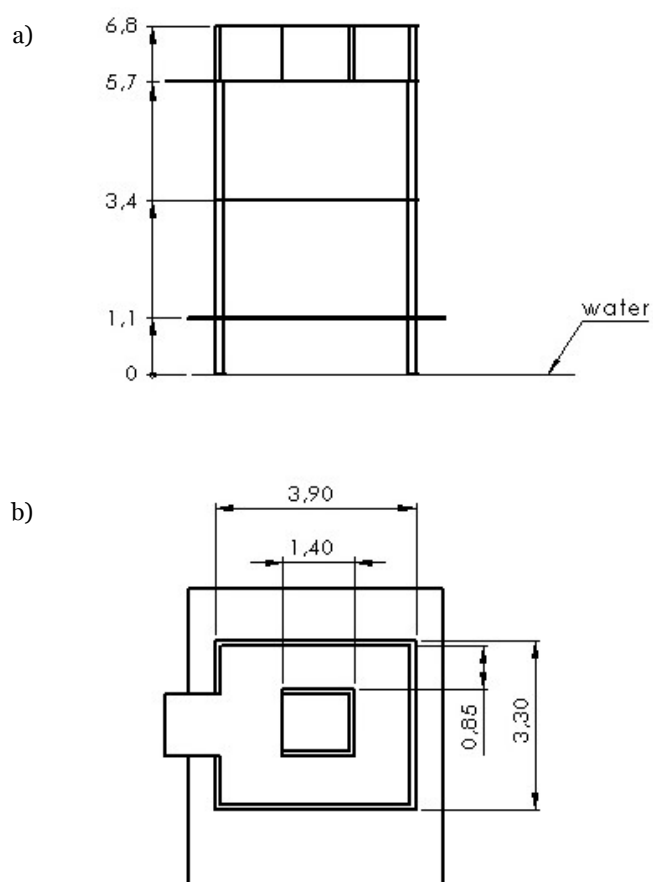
Dimensions of the diving platform in metres, a) – front view, b) – top view.
